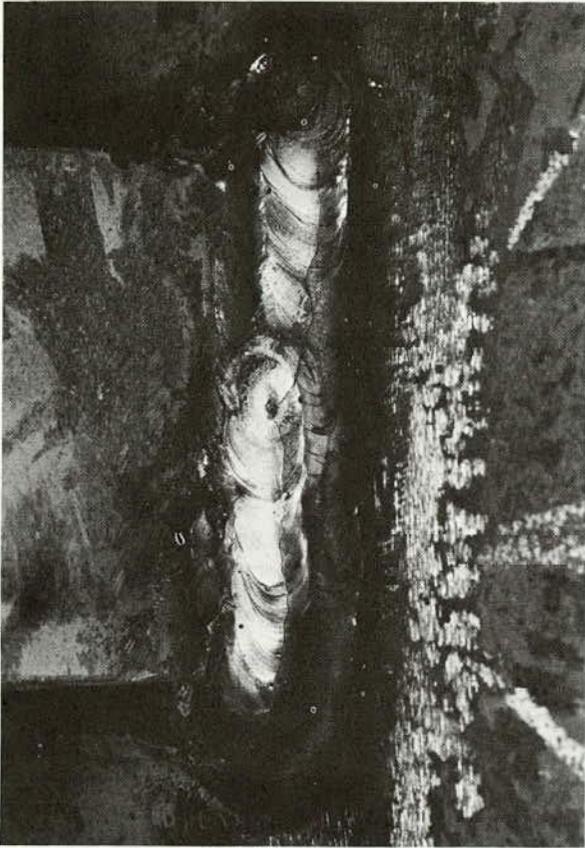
Crack through throat of fillet weld connecting insert plate to girder web.
